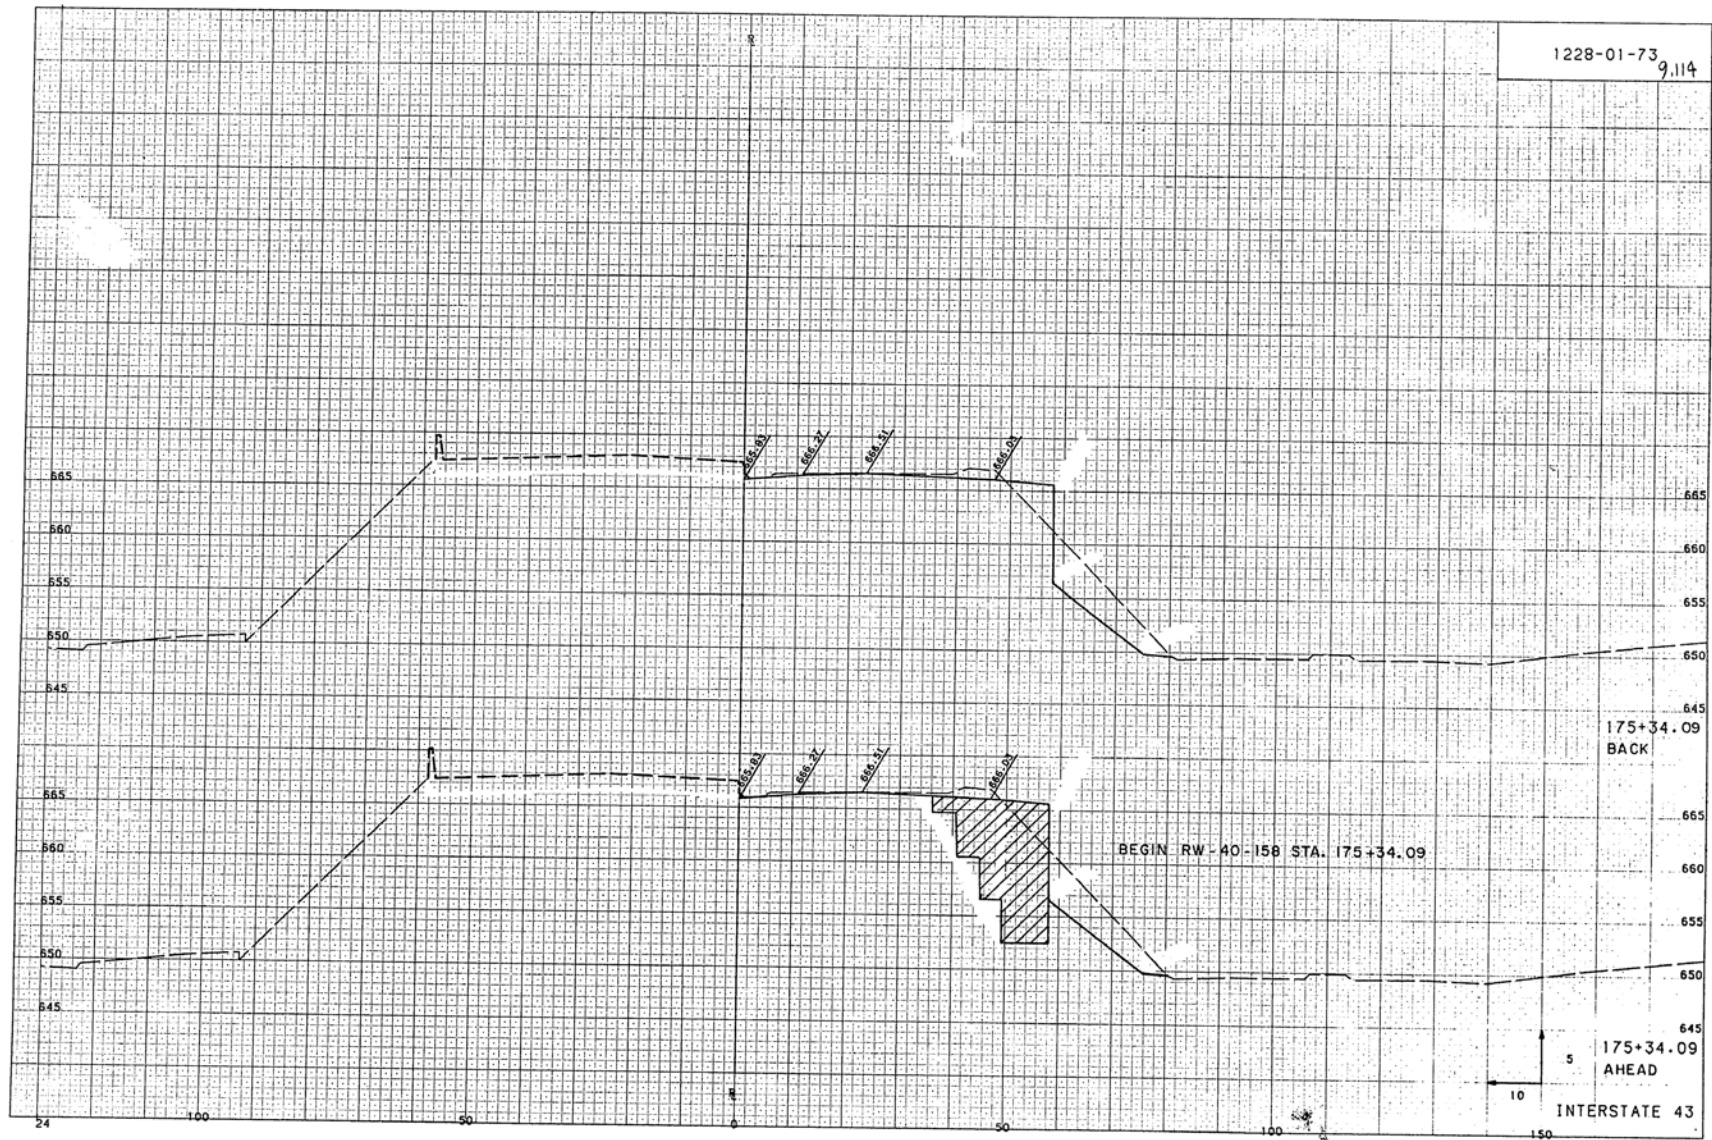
Example design cross sections showing existing and proposed surface ground elevations. The hatched area shows the location of reinforced fill material and dashed line shows the existing ground prior to the construction of the MSE wall.
